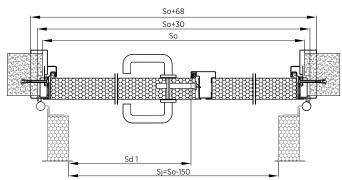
Installation of a double-leaf door to a masonry wall – corner frame with a thermal break – horizontal cross-section
